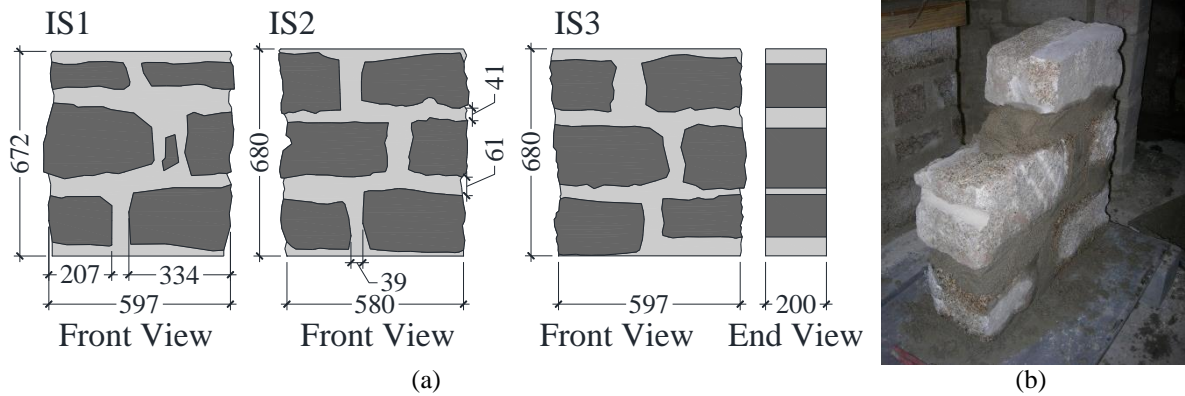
Irregular masonry wallets: (a) geometries (dimensions in mm); and (b) construction
